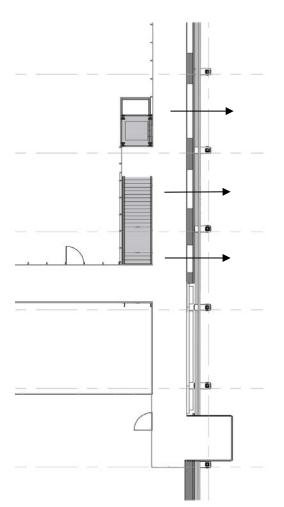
Proposed Bay 2 & 3 Wall – Level 1 Source: Sissons
